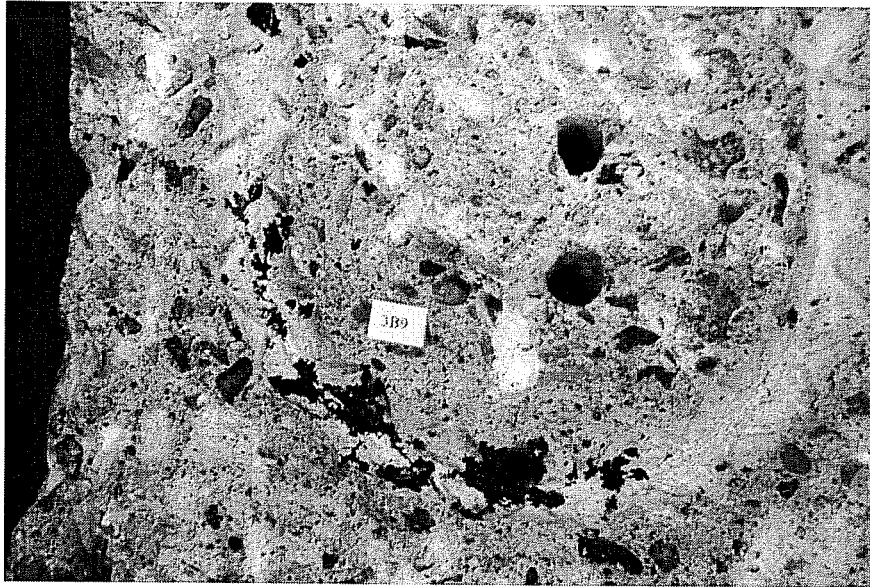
Damage on Concrete for Epoxy-coated Bar (3B9).
